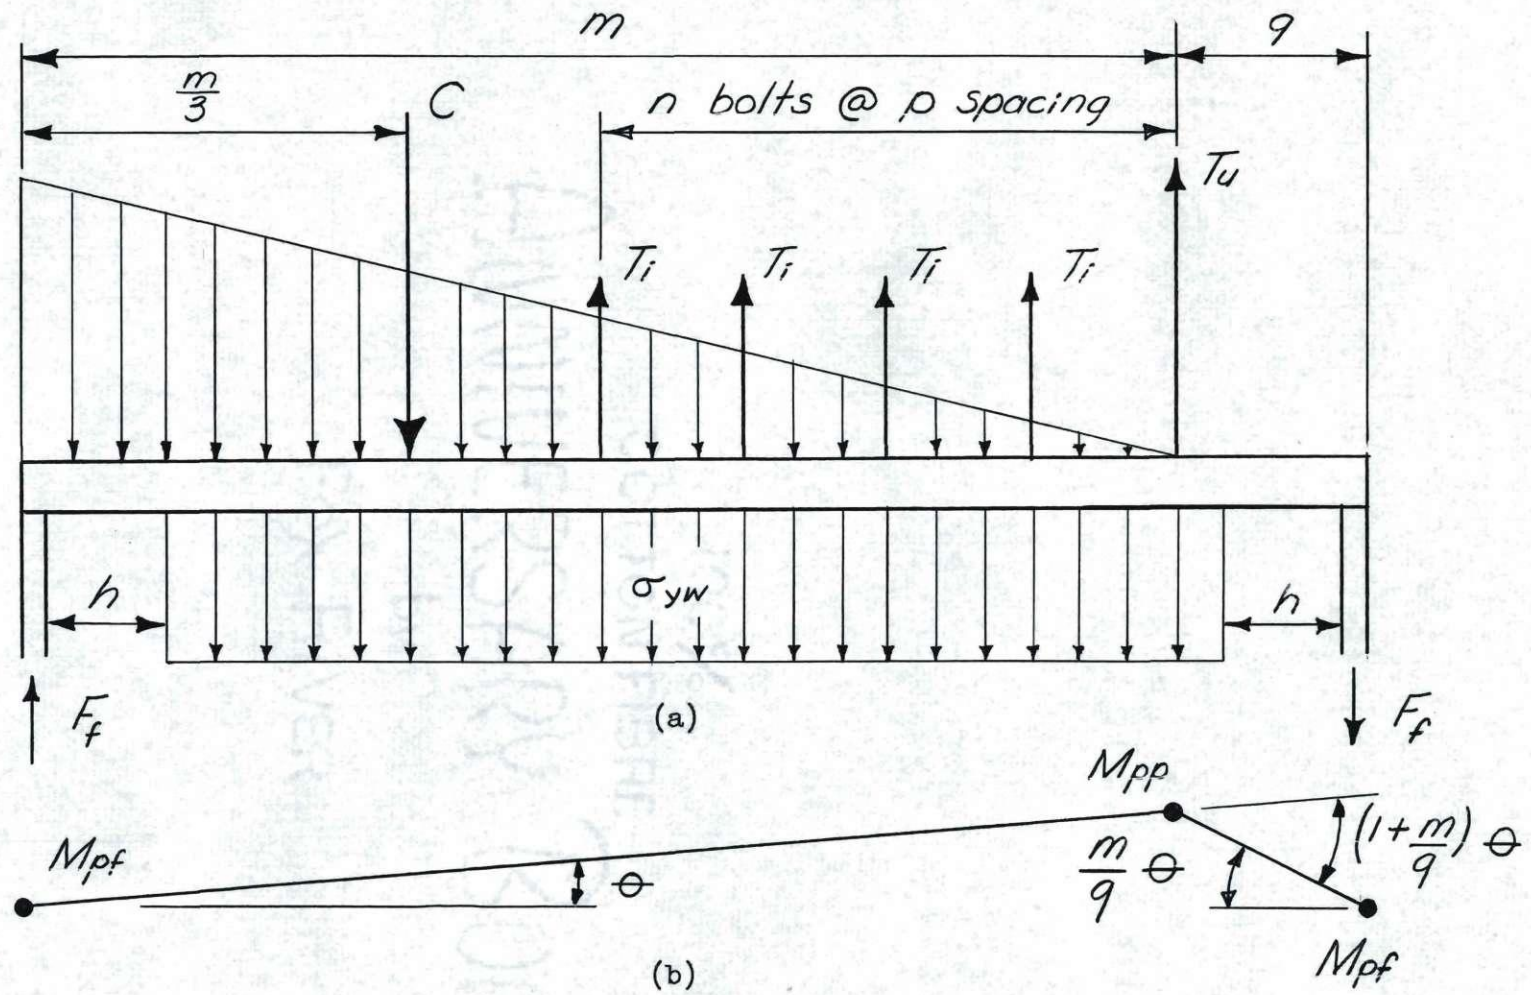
Freebody and Failure Mechanism of Connection Plate
